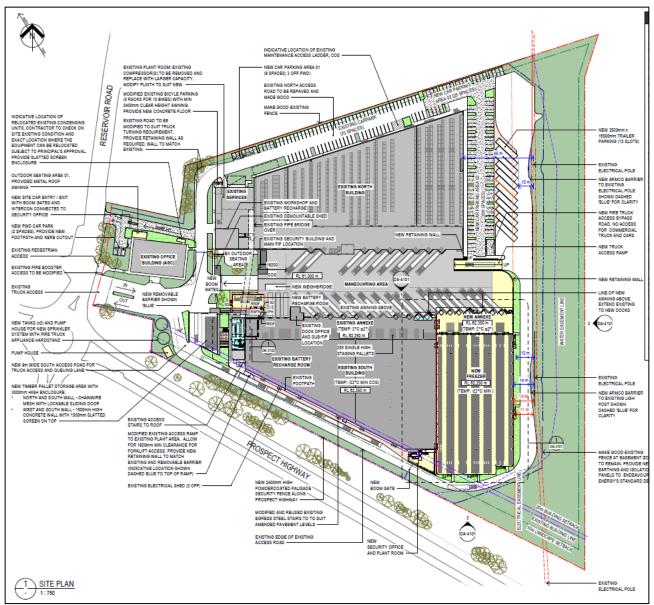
Site Development Plan (refer Appendix E for detail)
